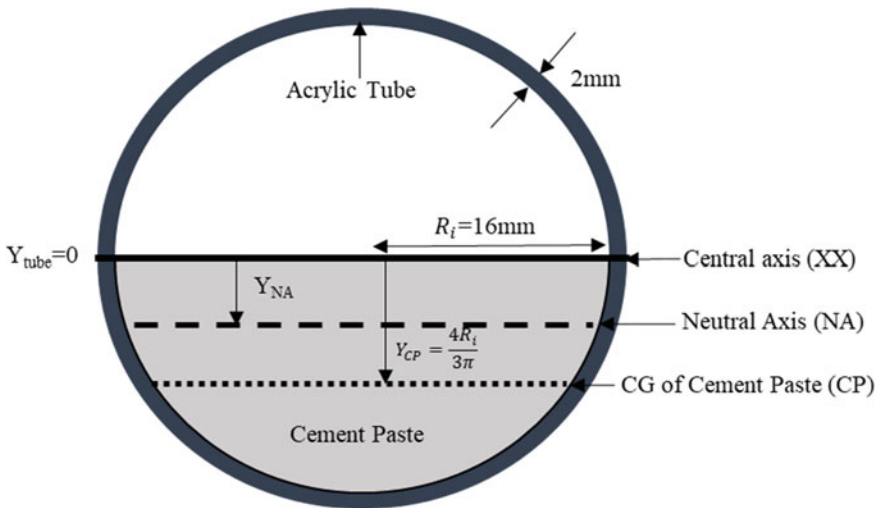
Cross Section of the half-filled tube for the EMM-ARM
